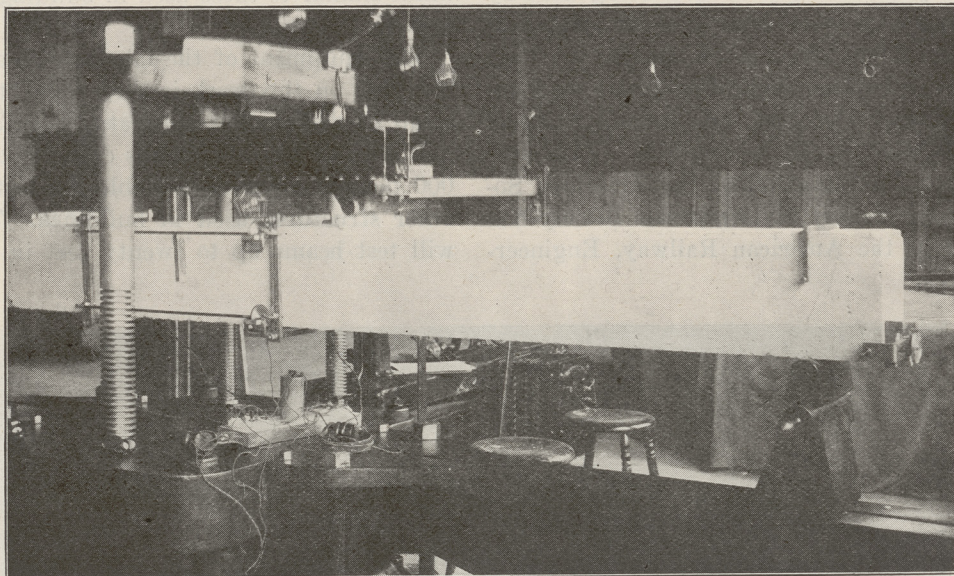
TESTING A THIRTEEN-FOOT CONCRETE BEAM.
